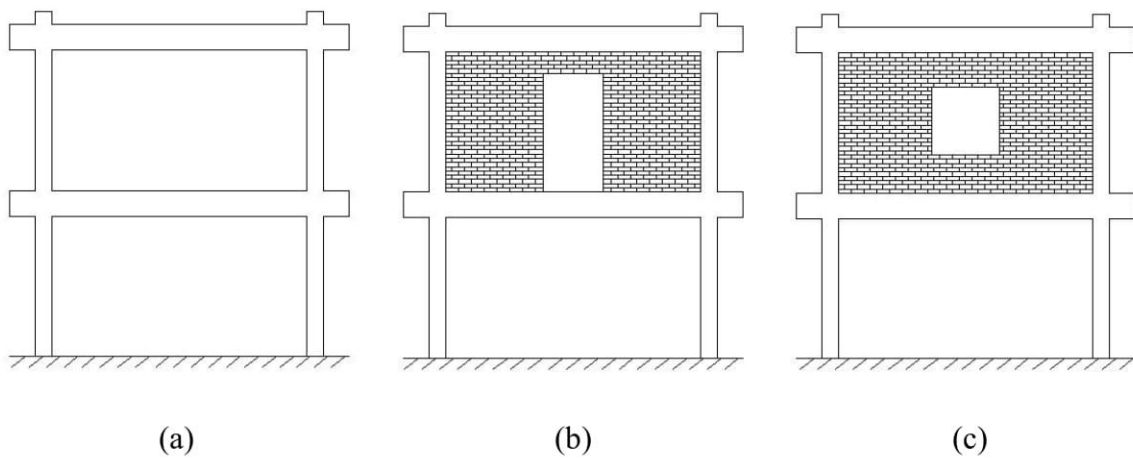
Model of two storied single bay RC (a) bare frame (b) infill frame having door opening and (c) infill frame having window opening
